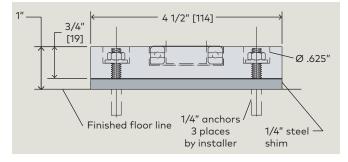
Floor surface-mounted pivot bearing assembly installed on floor
